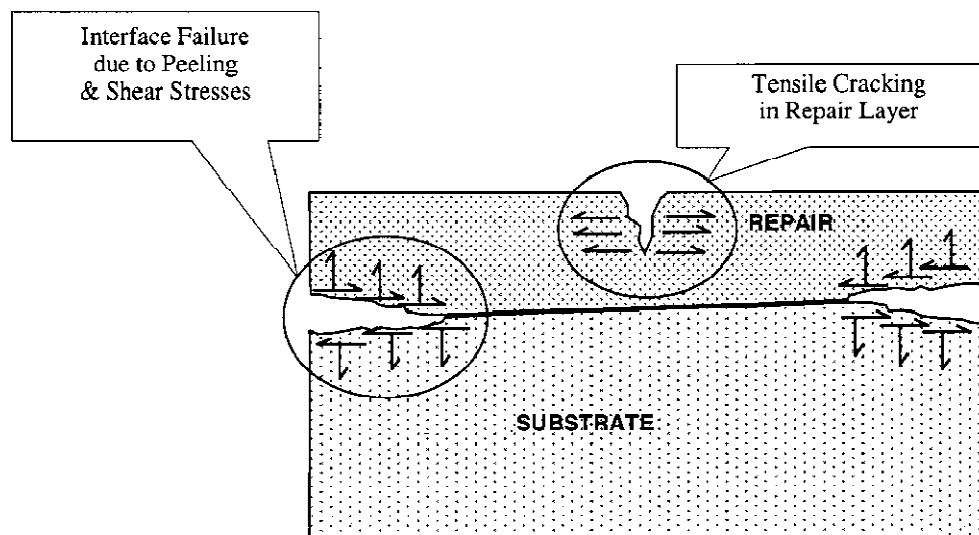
Modes of failure in patch repair (Baluch et al. 2002)
